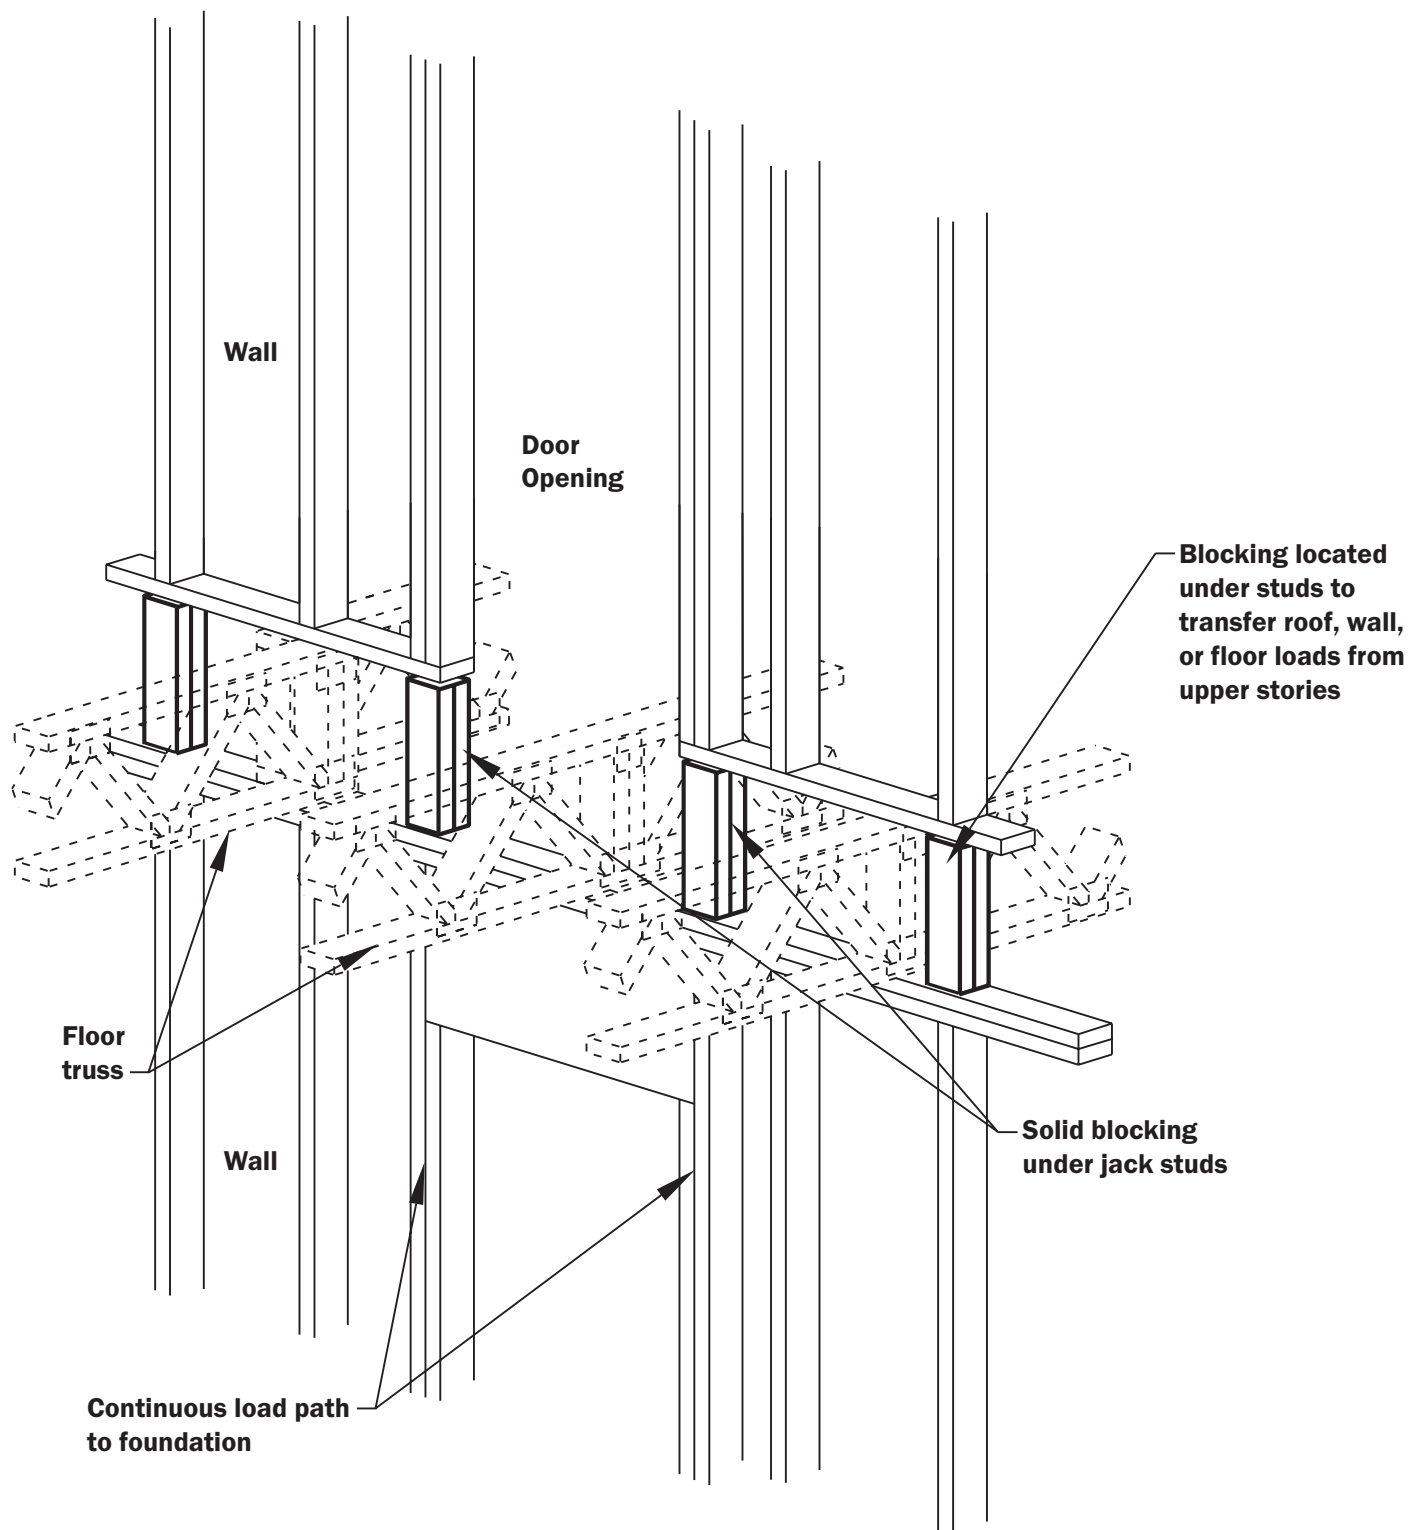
Blocking in Floor Space at Interior Loadbearing Walls
